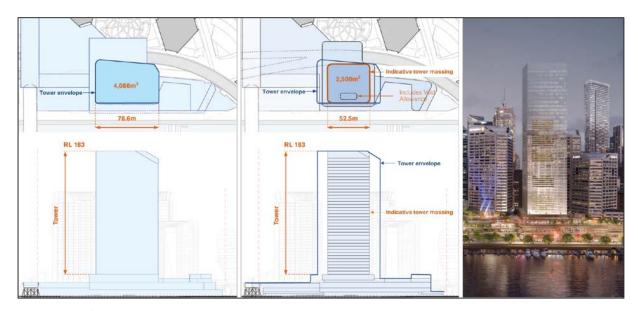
| Proposed building envelope (left) indicative massing (middle) and indicative scheme (right) (Base source: Applicant's RtS)
